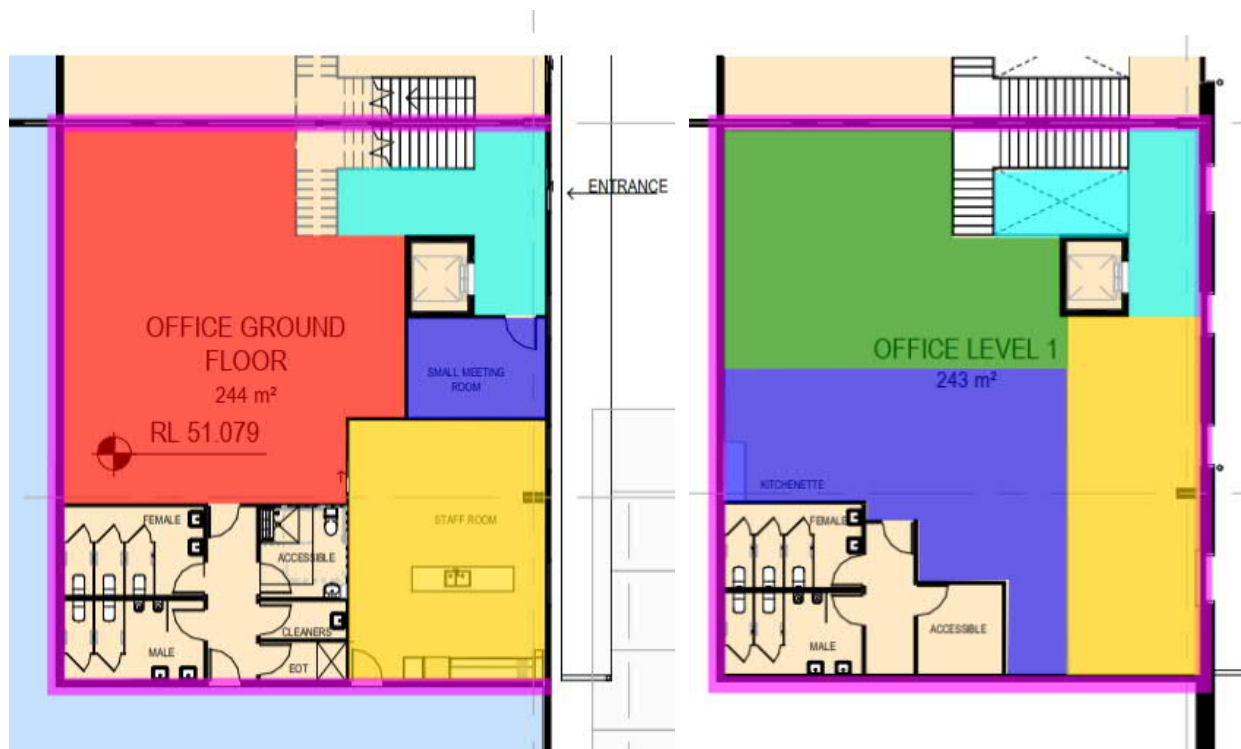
HVAC zones & thermal envelope for 1 Senator Drive Ground Floor (Left) and First Floor (Right)
